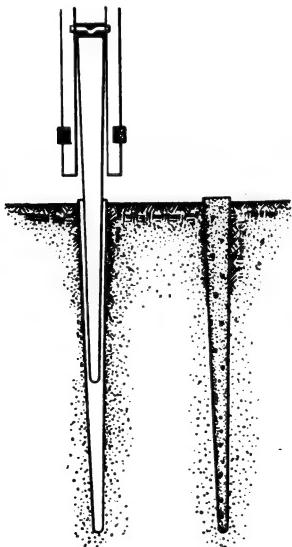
Raymond pile core collapsed and partly withdrawn. Completed Raymond pile without reinforcement.
